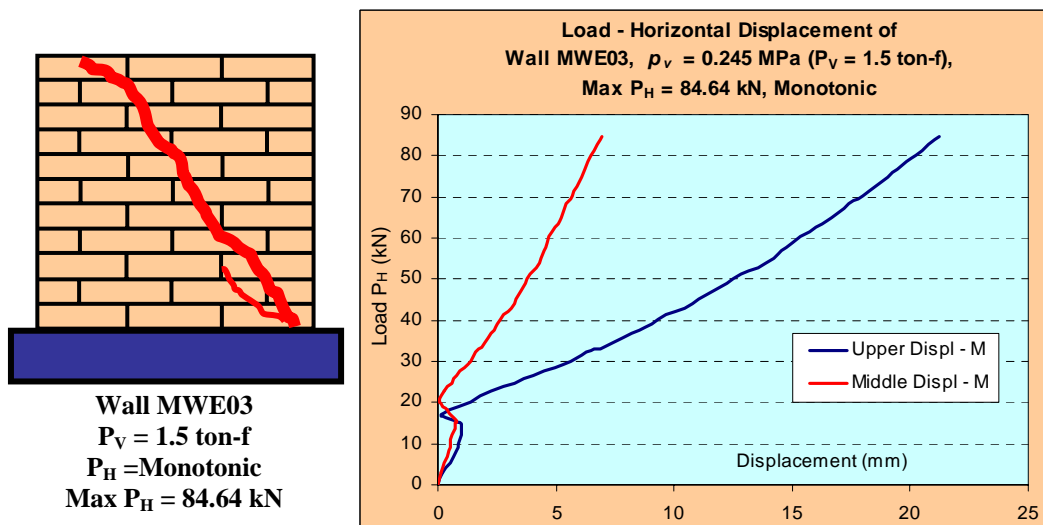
Failure pattern and load-displacement of wall MWE03
